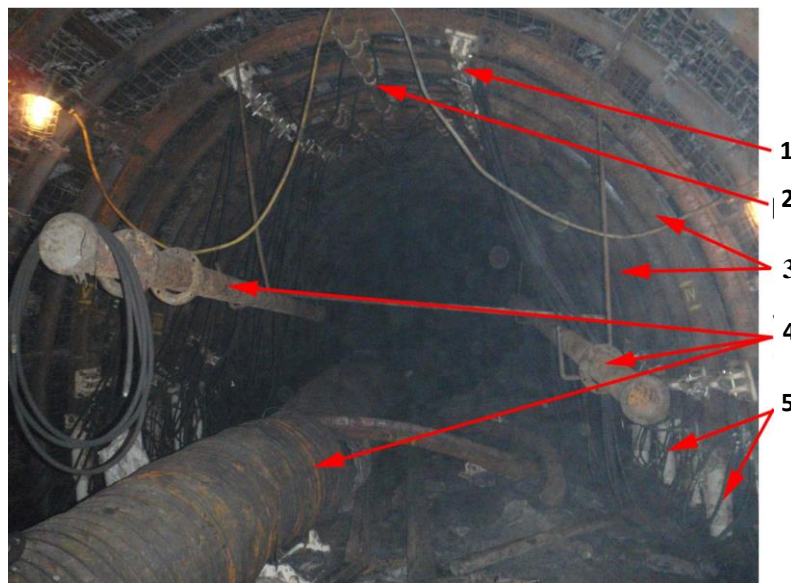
Operational tests of the temporary mechanized roof support in an underground excavation:
